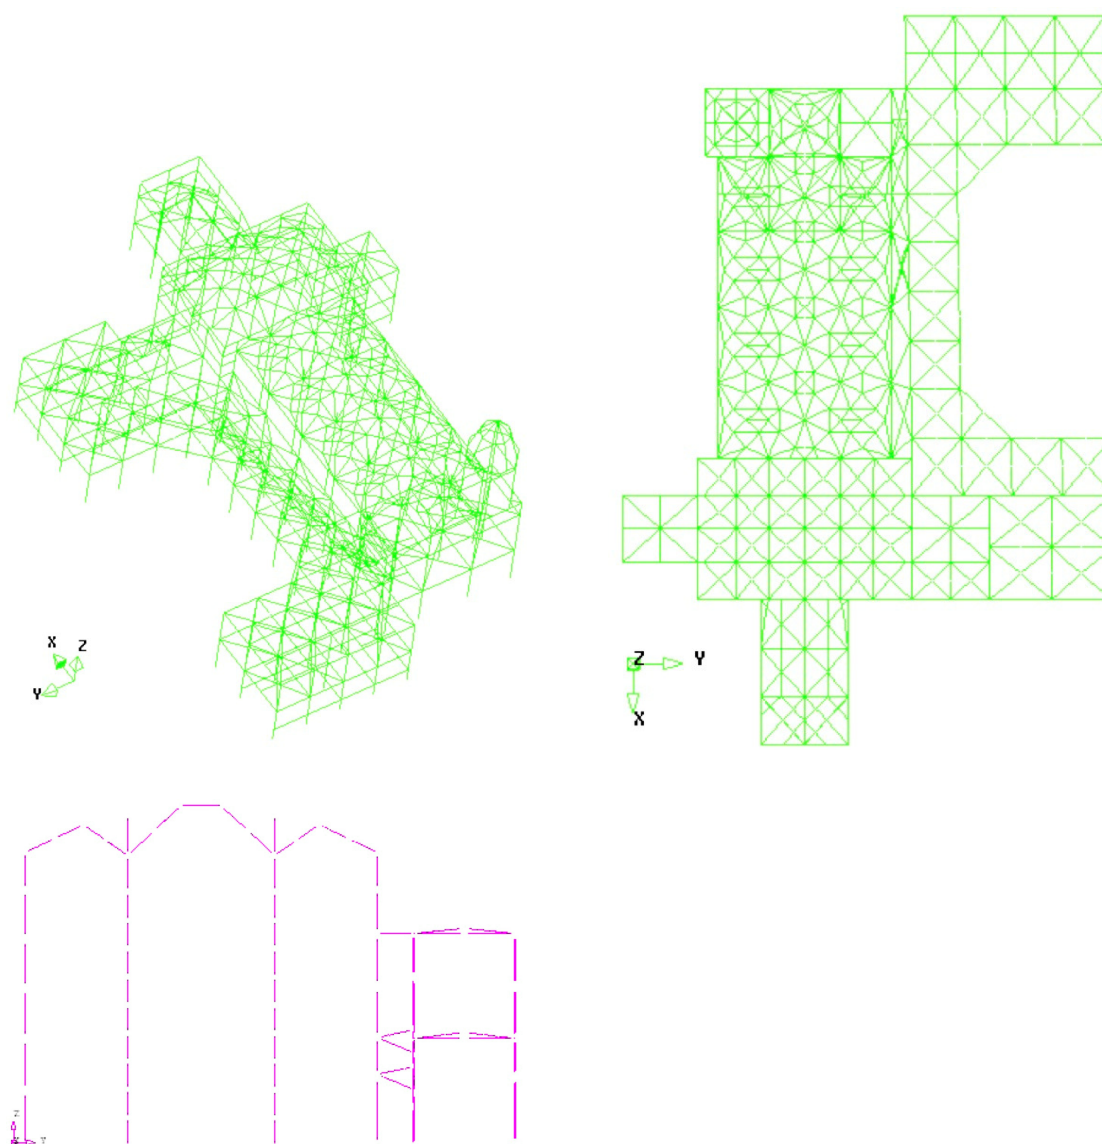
Finite element model: (a) 3D view; (b) plan view; (c) central arcade of the nave in transversal direction, adapted from (Masciotta et al. 2016).
